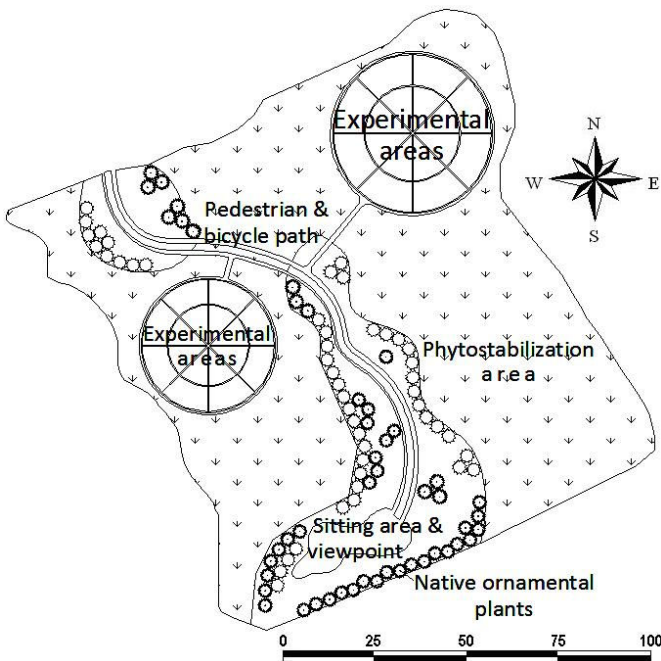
Proposed design of El Lirio mine tailing (Autocad 2008)
